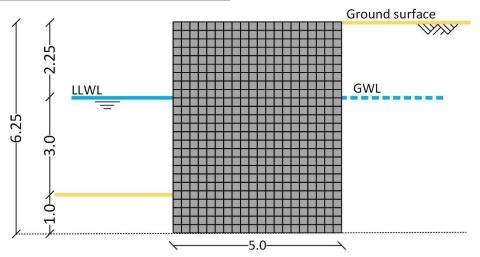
The geometry of the gabion quay wall (dimensions in m)
